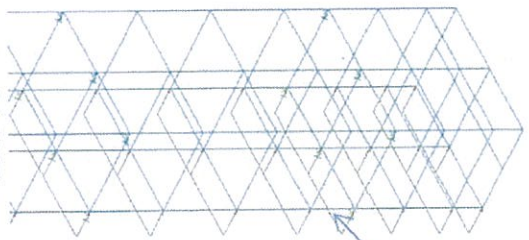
Lateral Load acting on Horizontal Member where contact with Rail
